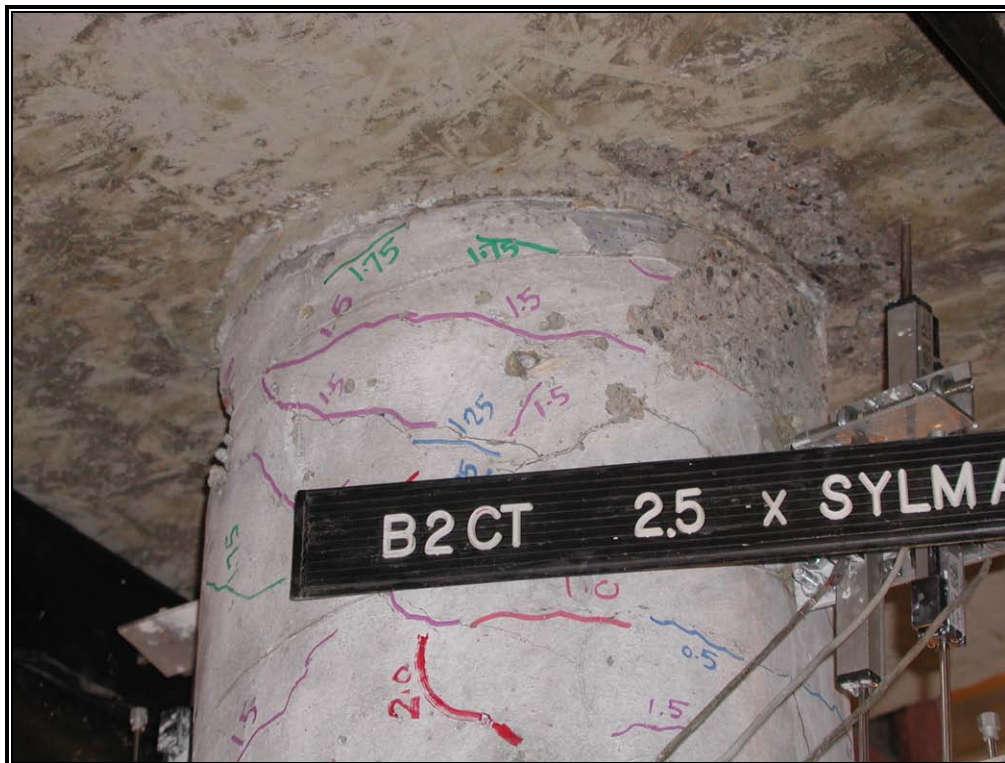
Minor Spalling in Cap-Beam
